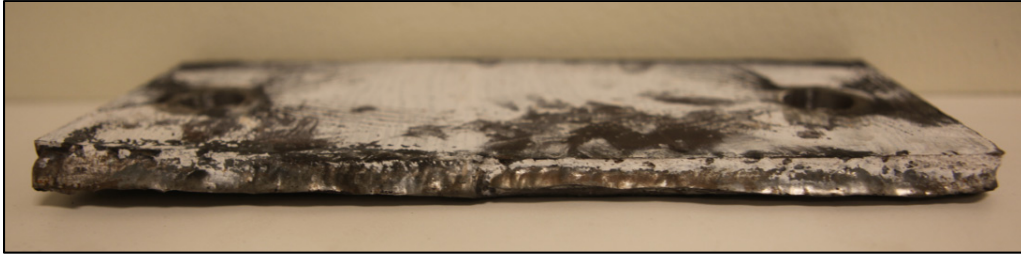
Final fracture state of weld of shear tab (welded) after plate removal.
